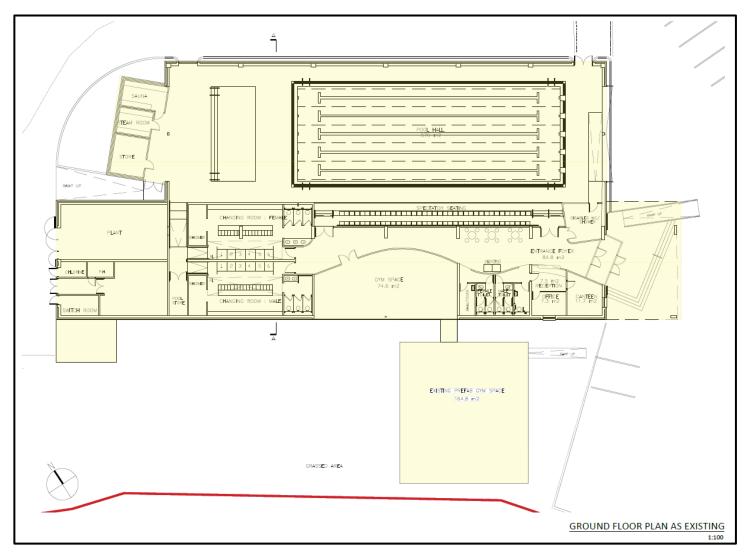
EXISTING SITE LAYOUT (TOBIN CONSULTING ENGINEERS, 2024)
